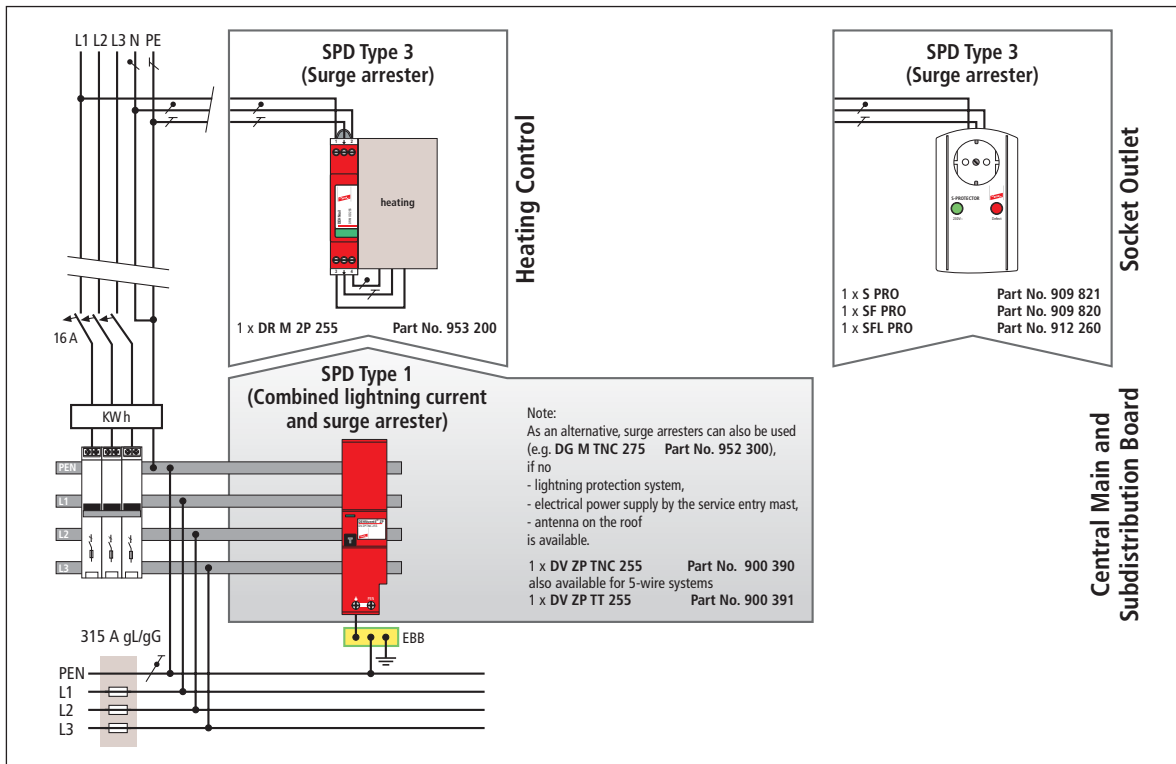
SPDs used in TN systems – Example: Residential building
